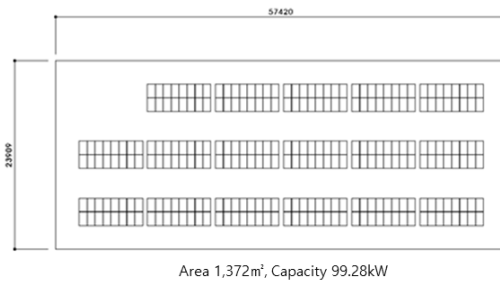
Floor plan of 100kW capacity site in Fig. 17
